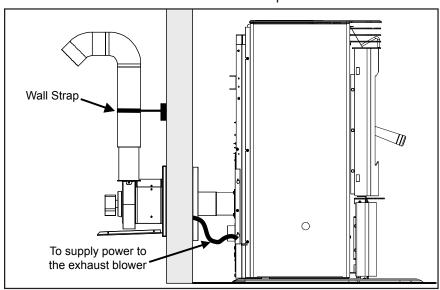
Through Wall Installation with Exterior Blower Kit; Side View.
